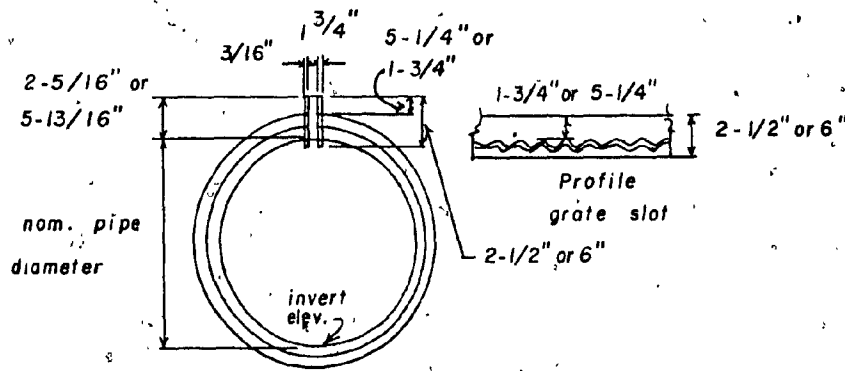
Cross-section of a typical steel slotted drain [5].
